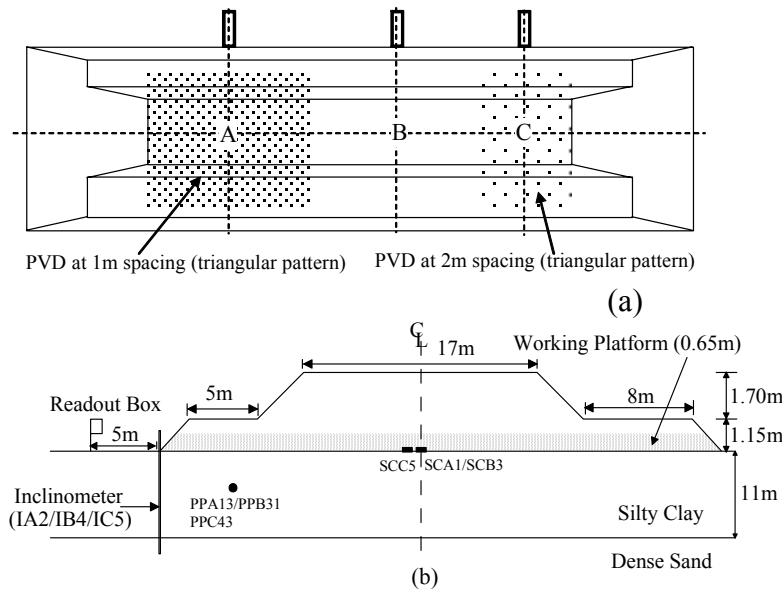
(a) Plan view of trial embankment, and (b) Typical cross-section of embankment with selected instrumentation points (adapted from QDMR, 1992)
